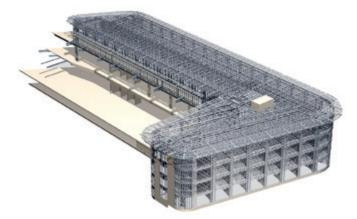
Structural model of light steel framing used in design and manufacture (Image courtesy of Metek UK)
